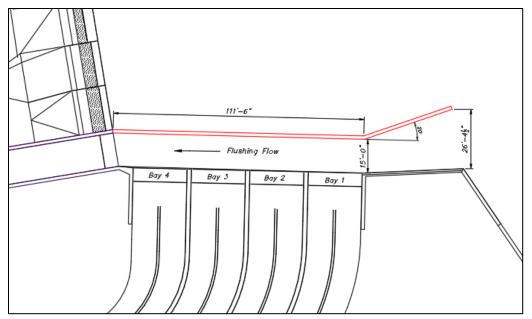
Layout of training wall parallel to the canal intake with a channel width of 15 ft.
